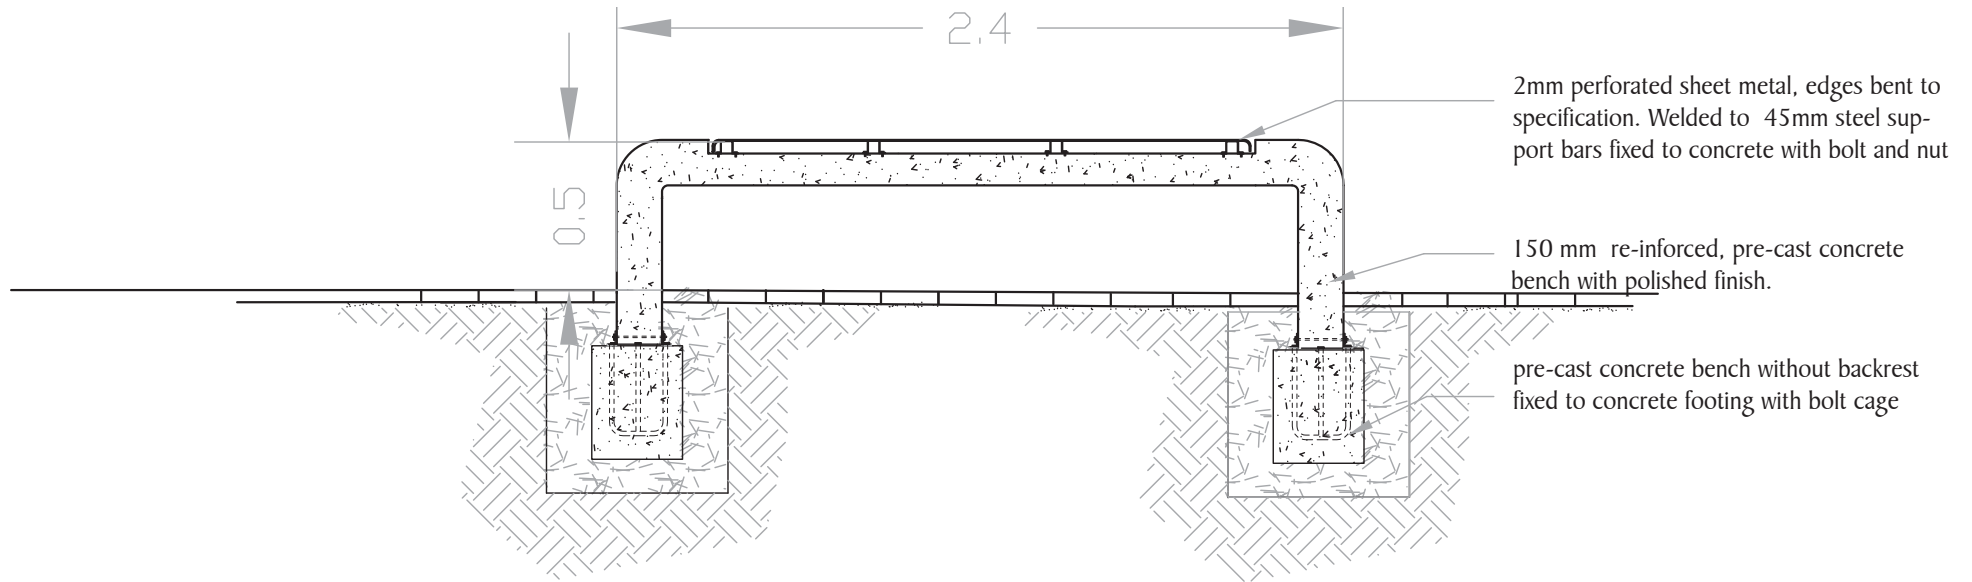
Bench without backrest Part elevation. Scale 1:25 (Author, 2008)
